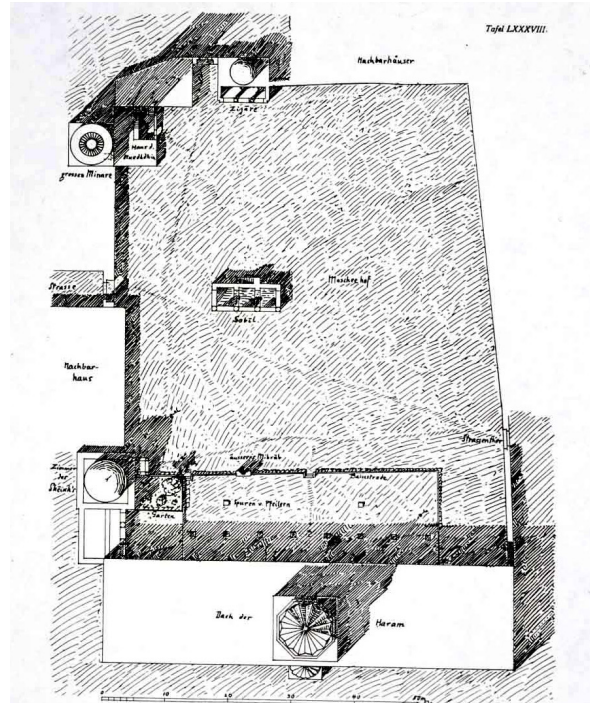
Layout plan of Al Nouri Mosque Complex and layout plan of the Prayer Hall at the beginning of the 20th century, 1920.
